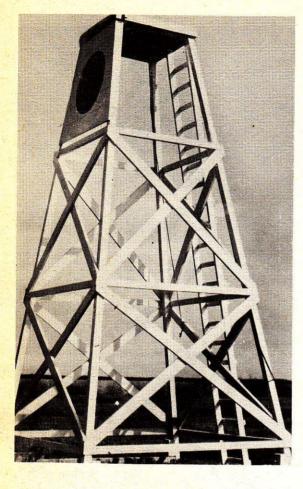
Wood skeleton minor light structure on stone riprap.
